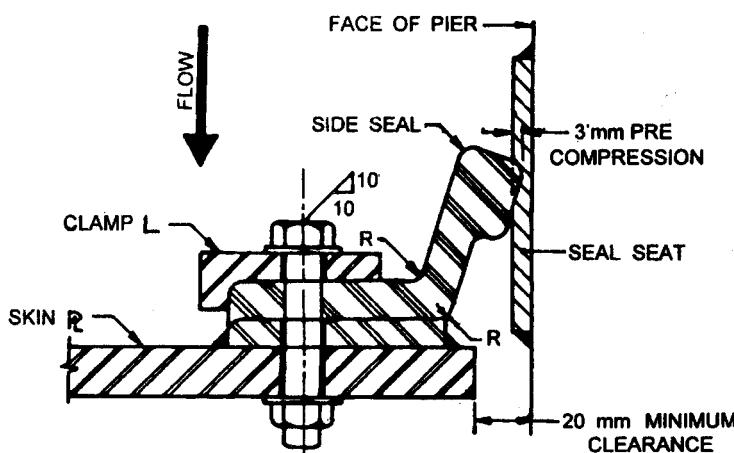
ASSEMBLY DETAILS WITH ANGLE SHAPED SEAL
